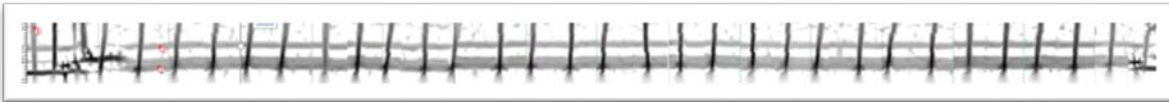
Blockscan of south exterior beam from east to west abutment (Bridge 8761).
